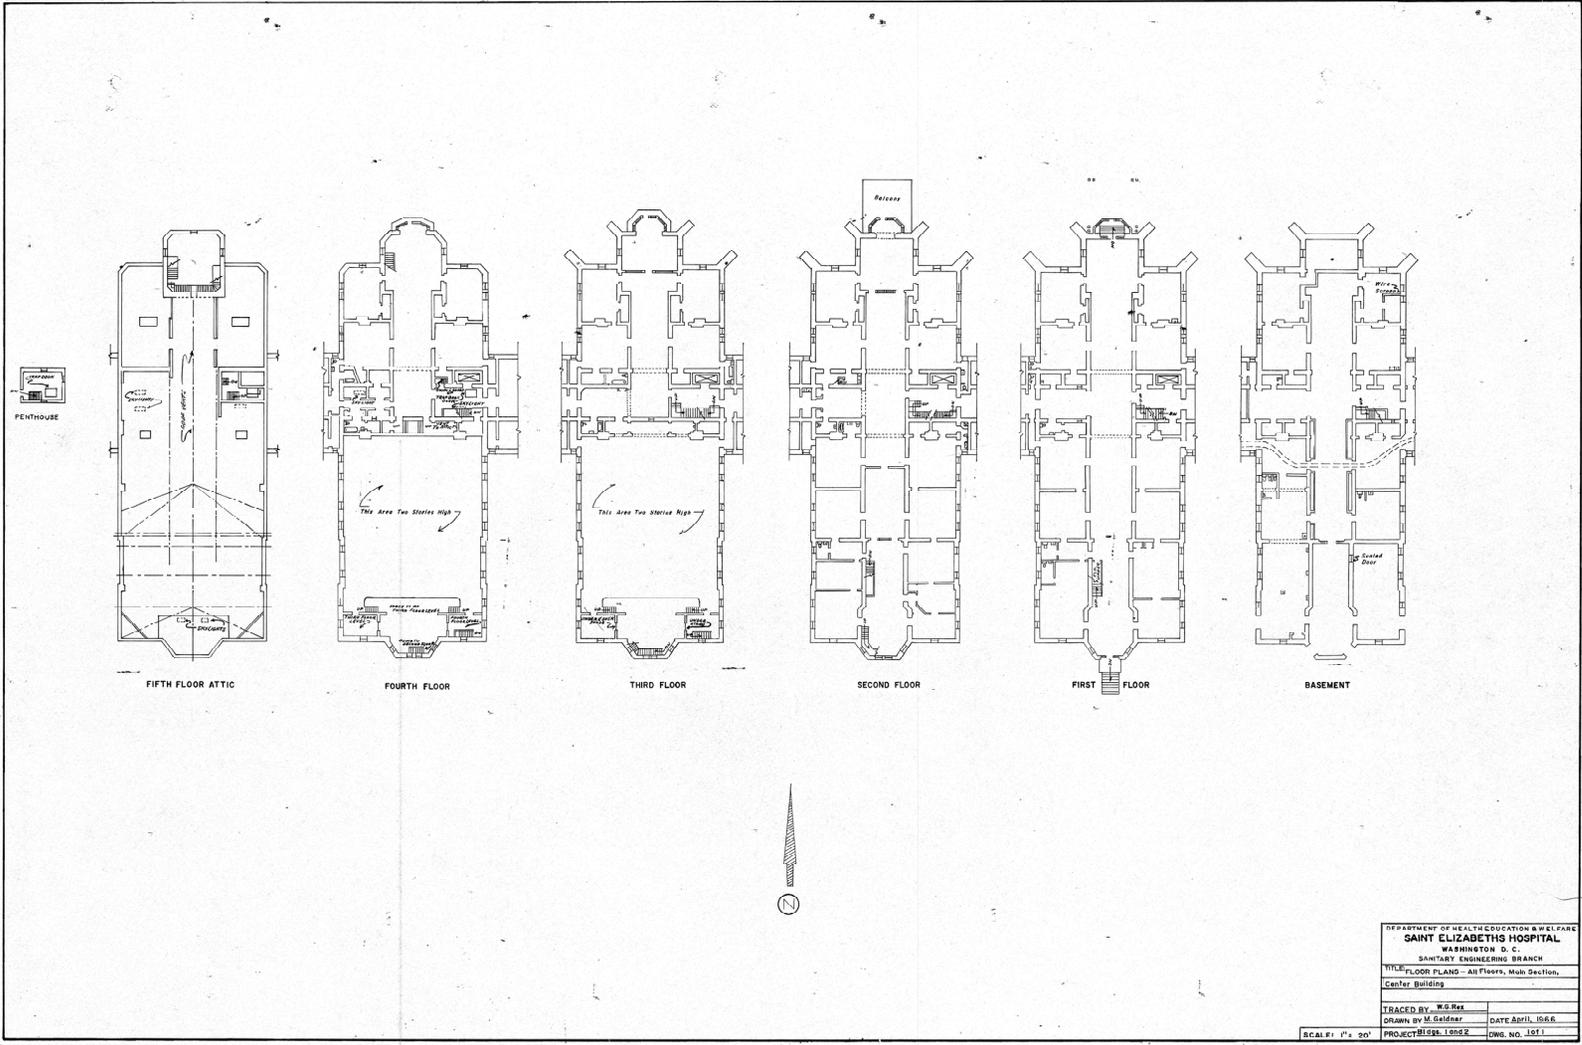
Floor plans of the Center Building, 1966. Source: GSA archives, image DC0066SE0132.
